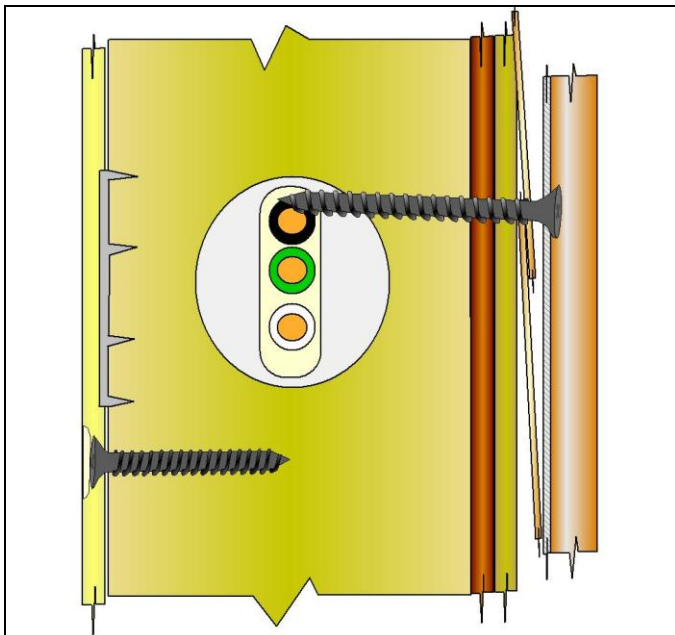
Add on porches with metallic frames need bonding to prevent shocks from electrical faults that occur when screws fastening aluminum track to the wall pierce Romex wiring inside the wall and energize the framework.
